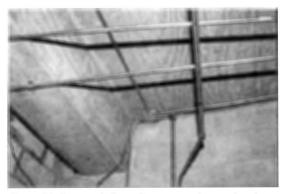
Concrete deck over basement and encased steel beam installed in the 1970s renovations
